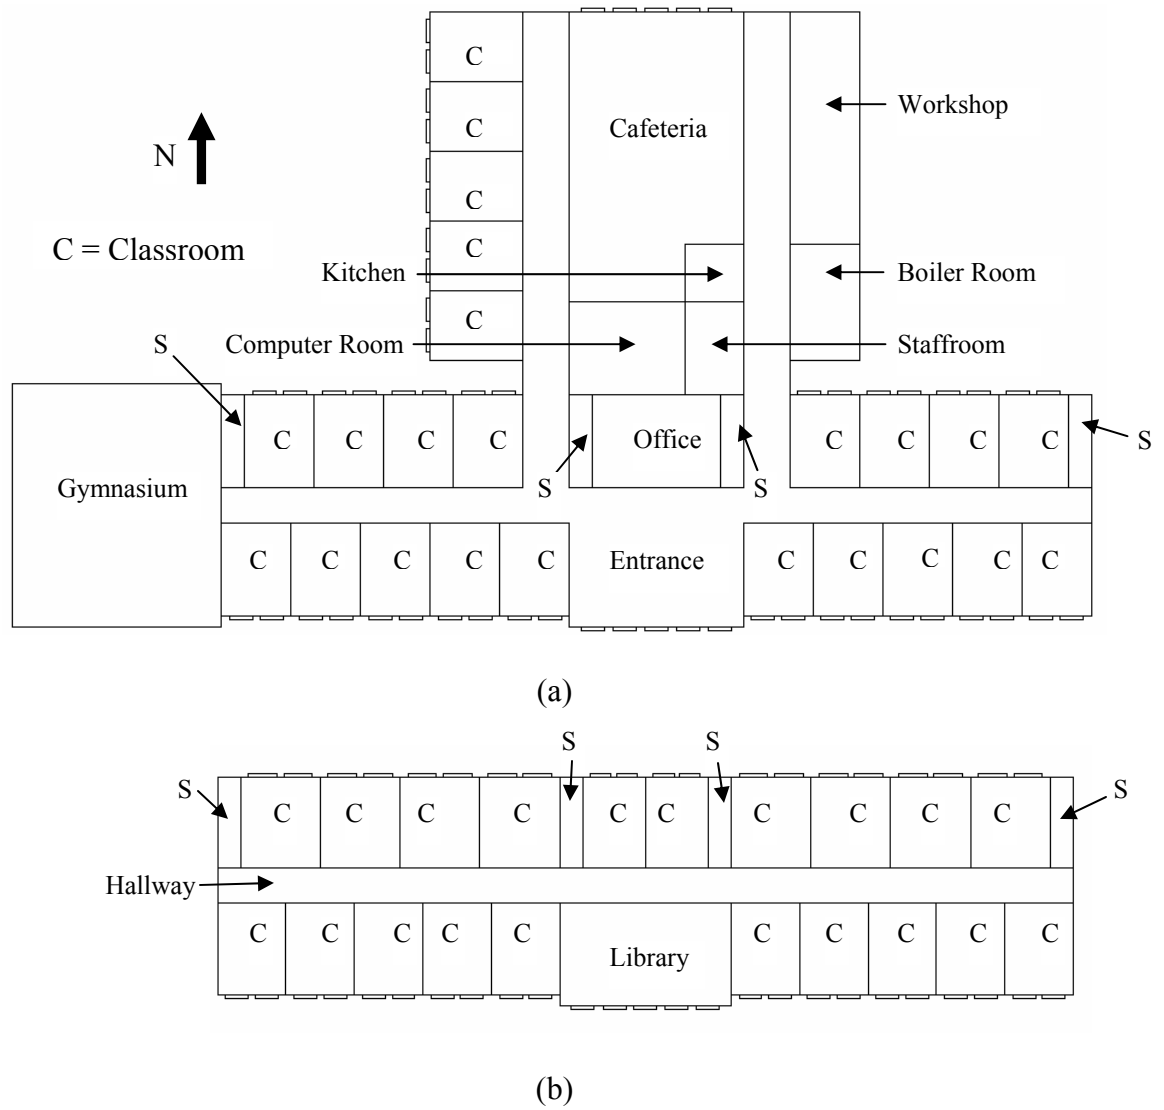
Floor plan of the first level (a) and the second level (b) of the school.
